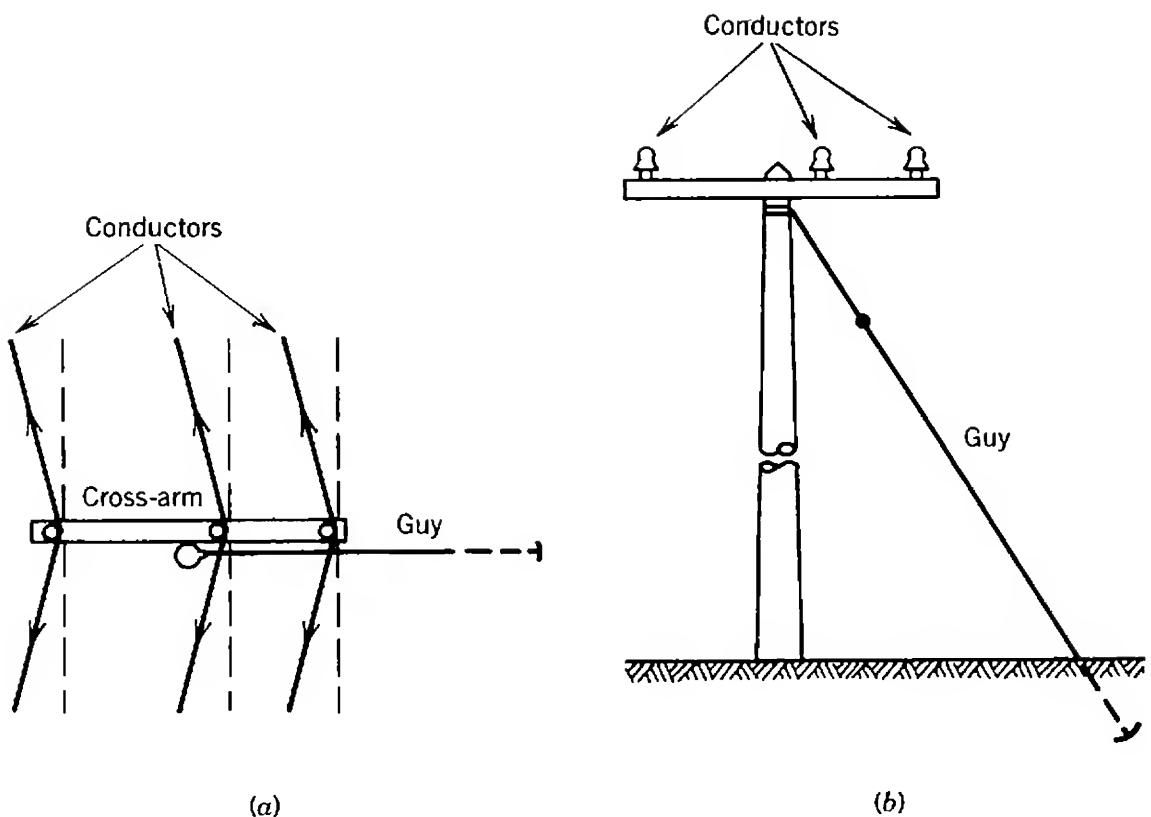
Guy installation at an angle: (a) plan; (b) elevation.
